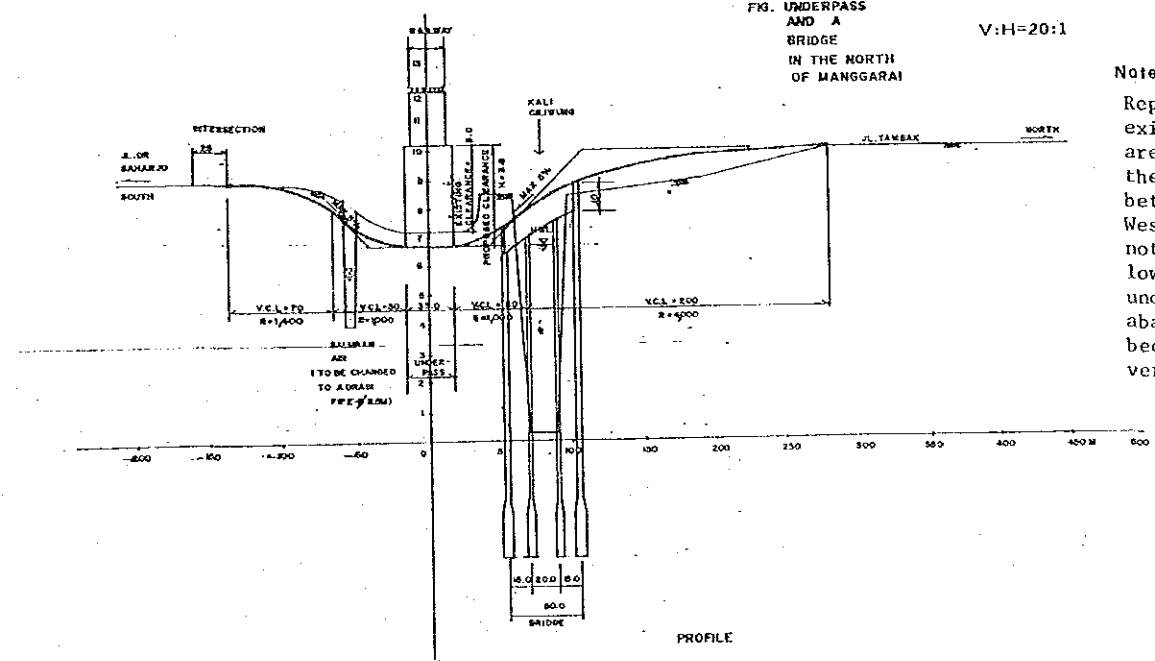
PROPOSED BRIDGE AND UNDERPASS (MANGGARAI)
